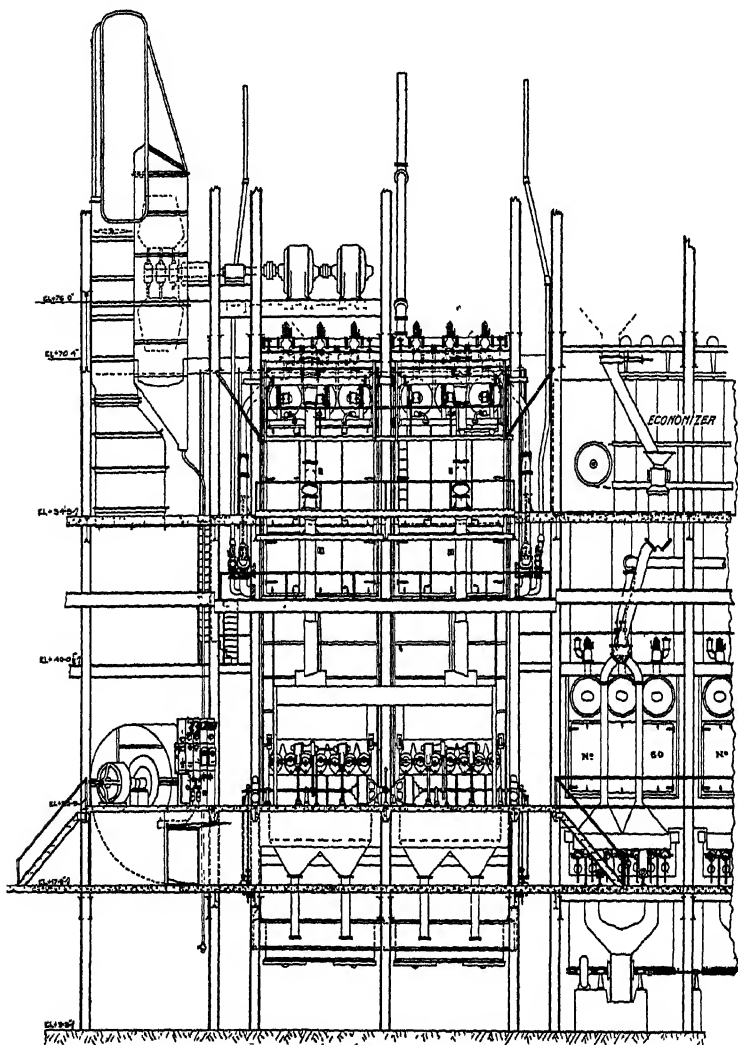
VIEW OF TWO OF THE NEW BOILERS, SHOWING ONE OF THE OLD BOILERS AT RIGHT
